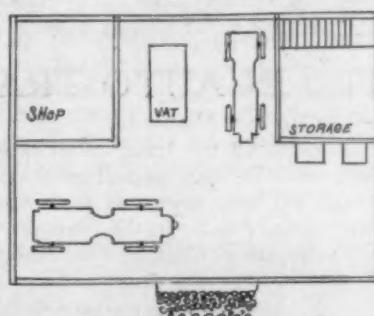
Floor plan arrangement for the autos and their appurtenances.
